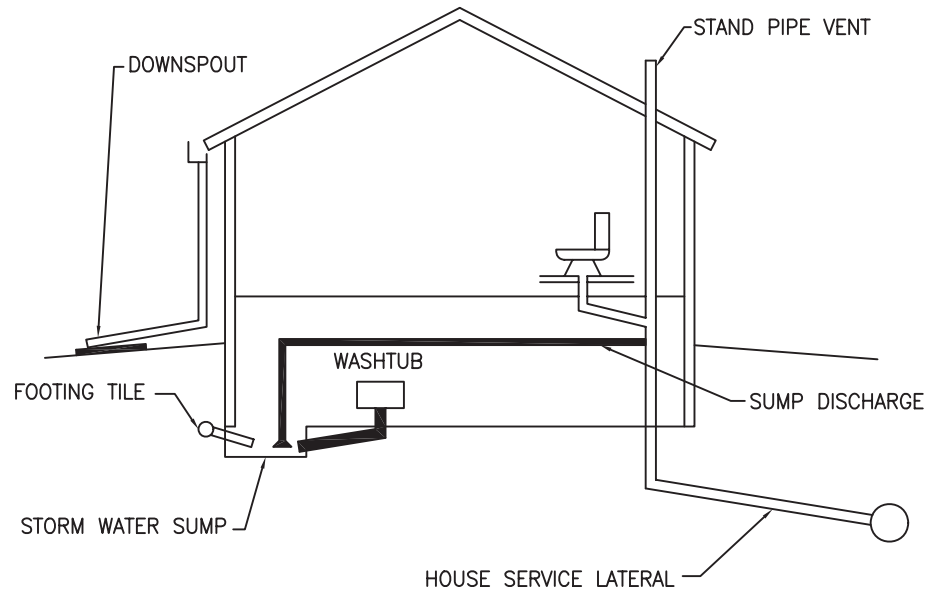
TYPICAL I/I SUMP CONNECTIONS
